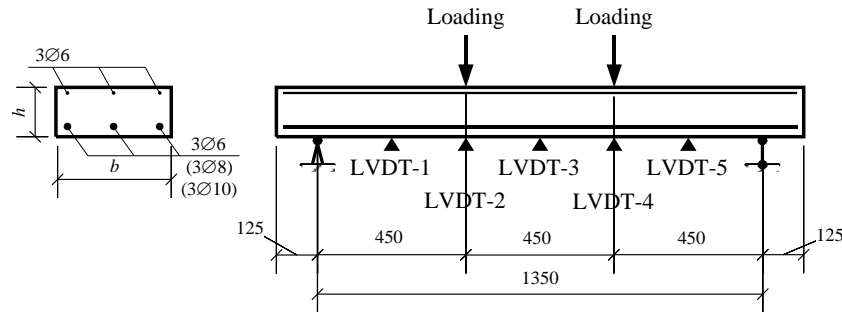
Dimensions and reinforcement layout of slab strips (dimensions in mm)
